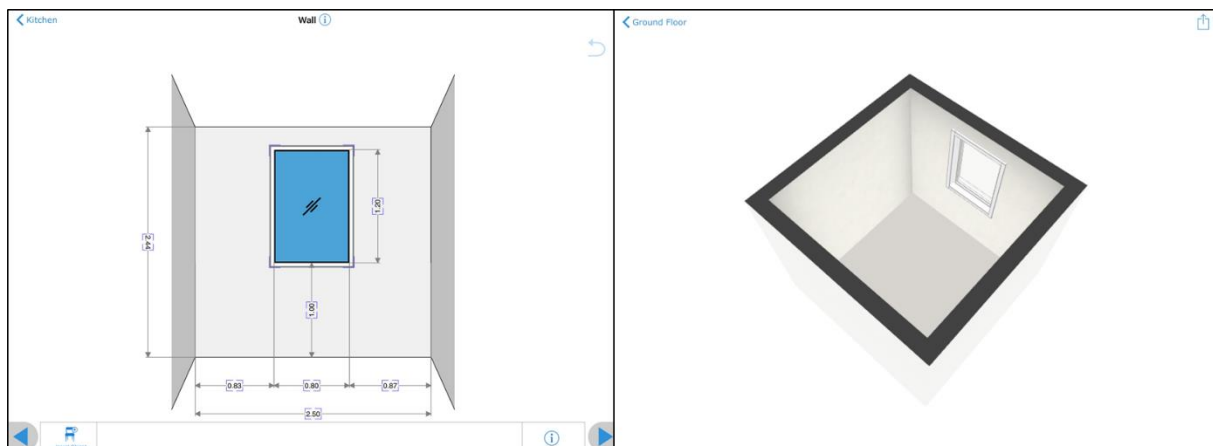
Left: Elevation of room in Magicplan. Right: 3D viewing of the same room.
